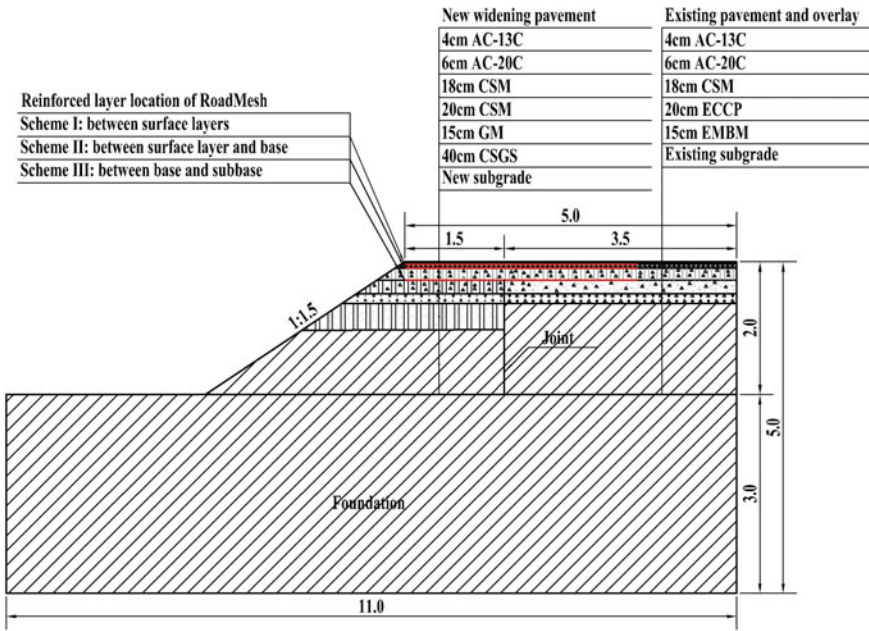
Semi-range cross section of widening subgrade and pavement (unit: m)
